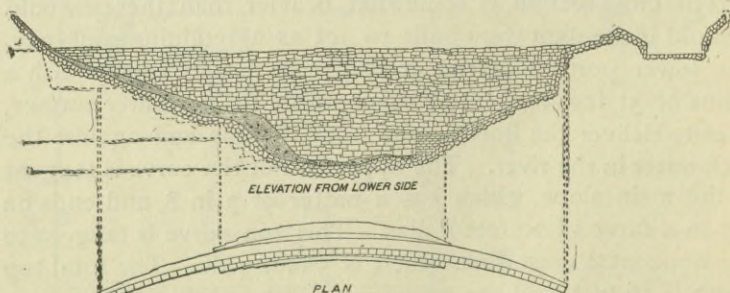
PLAN AND ELEVATION OF BEAR VALLEY DAM.
